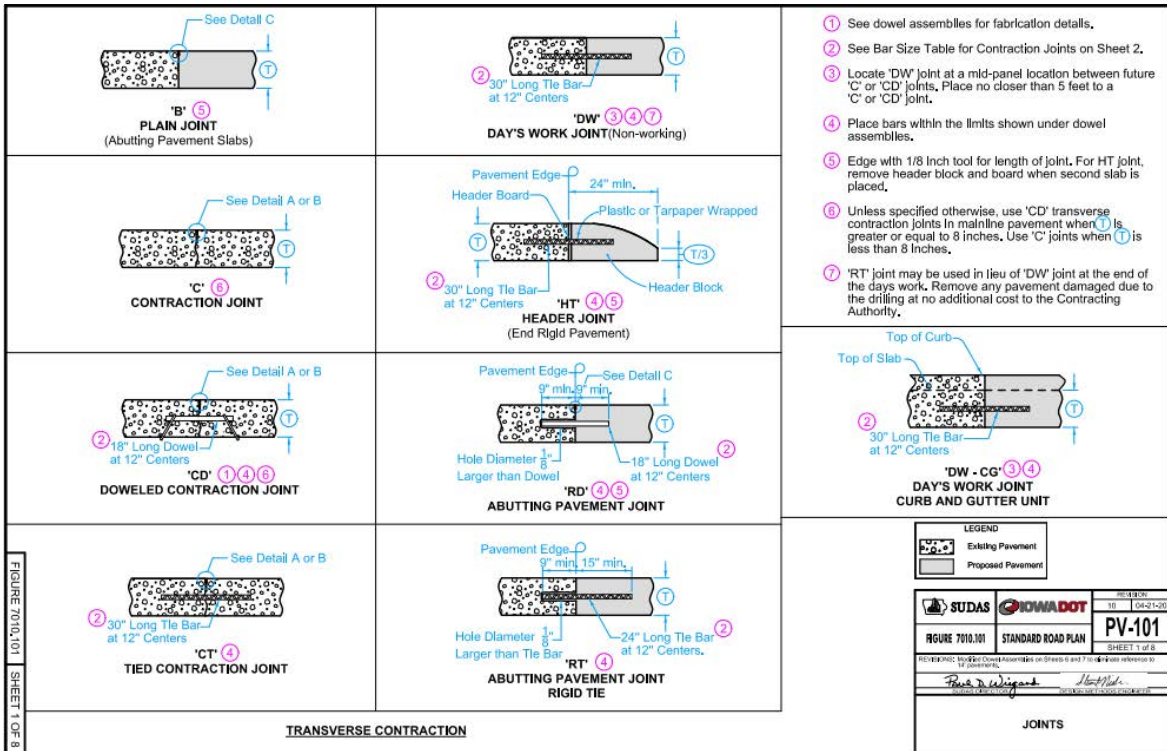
Transverse contraction joint design layout (Iowa DOT 2020).
